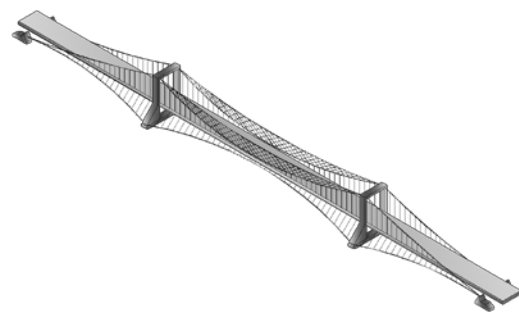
Prestressed suspension bridge with cable truss load carrying structure
